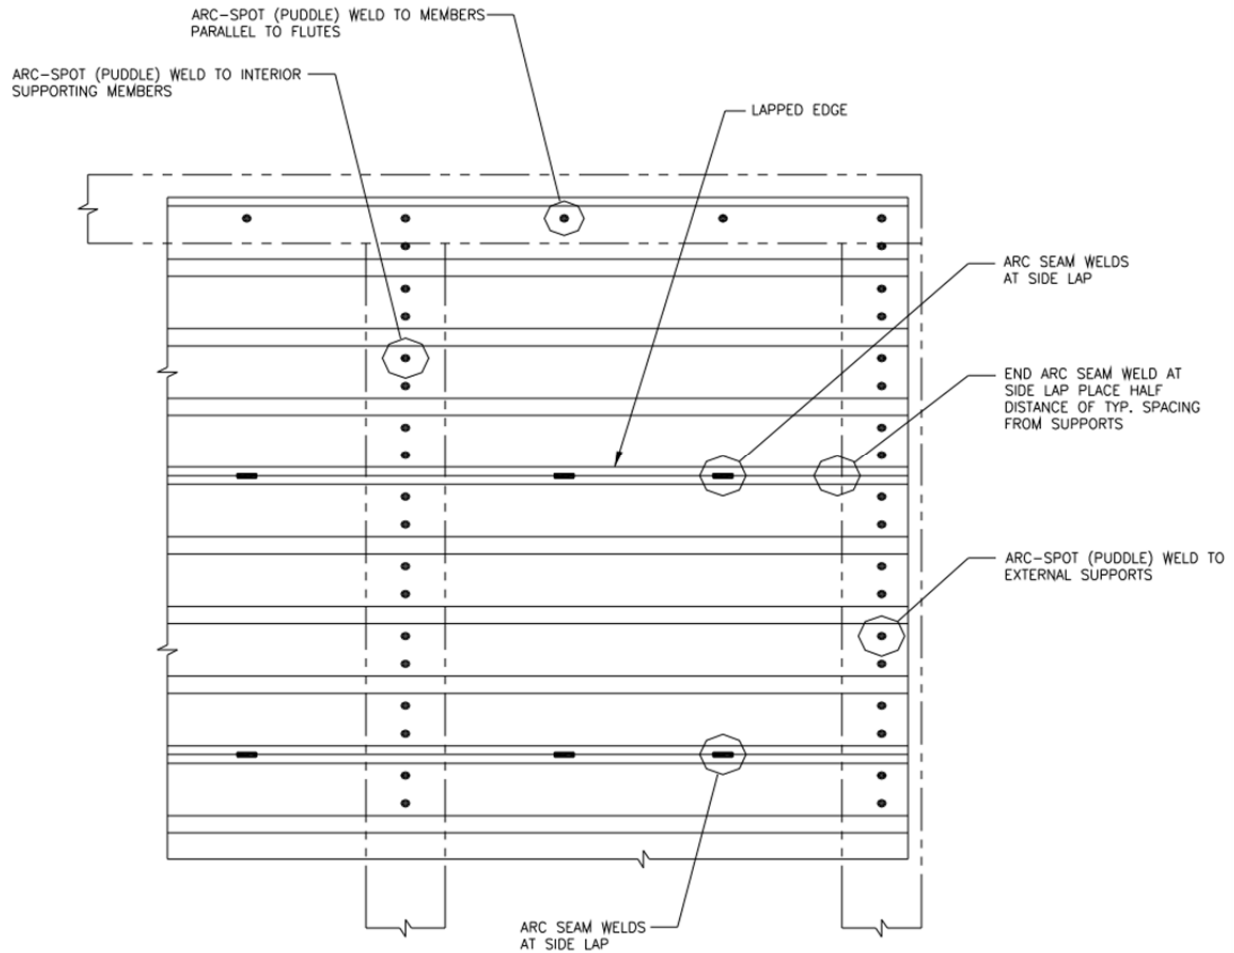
TYPICAL ARC SPOT WELD AT
